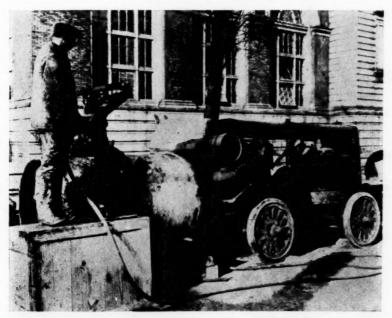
Airdrill Pipe Cutting Machine Showing Air Compressor and Connections
